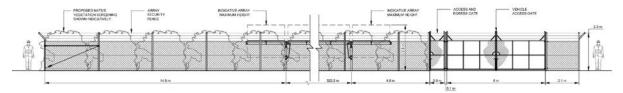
Western elevation of proposed security fencing showing vegetation screening.
